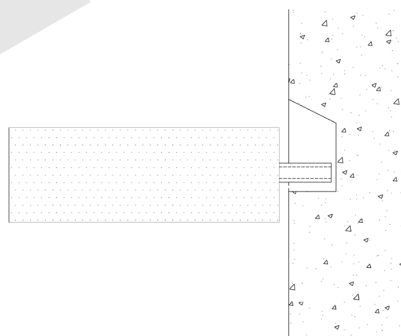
Section through sliding steel support from precast landing into insitu wall.
